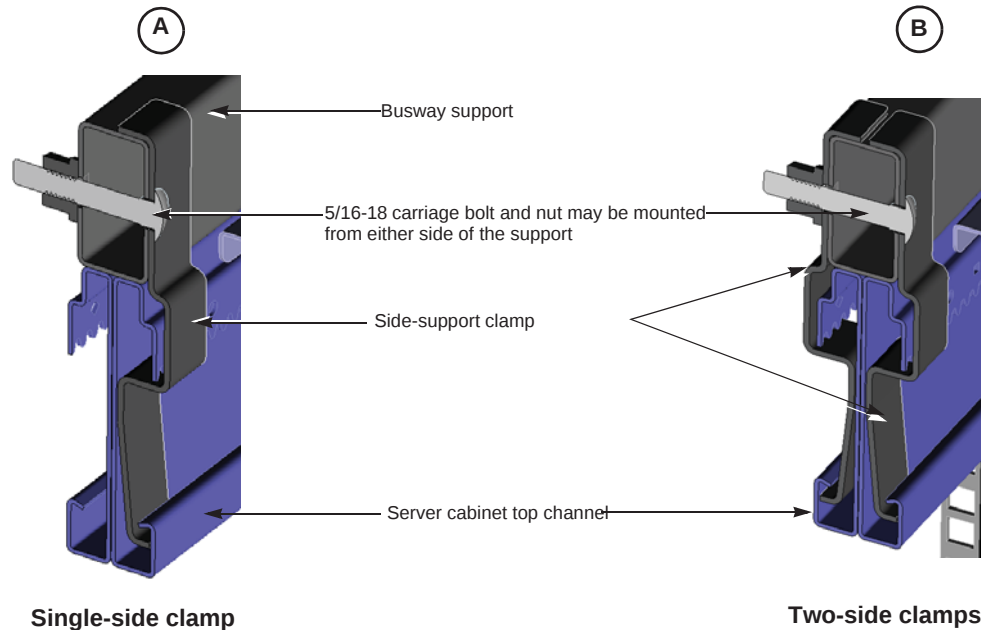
End-Support Clamp Attached to 23.6 in. (600 mm) SX Roof
